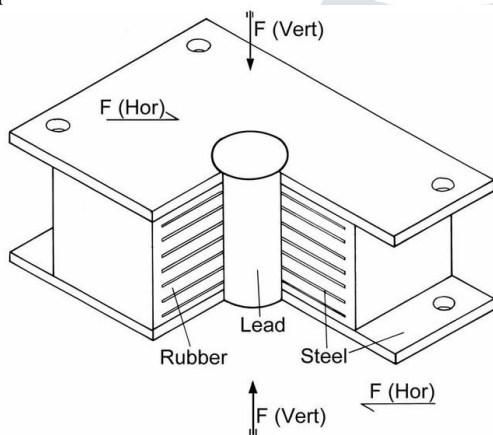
Lead Rubber Bearing with Layers of Rubber and Steel and Lead Core
